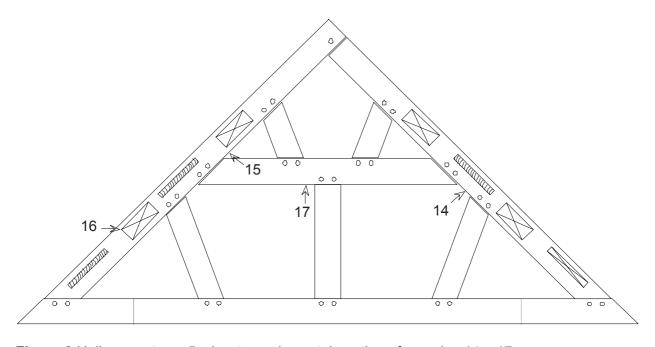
Hall range, truss 5, view towards east. Location of samples 14 – 17
